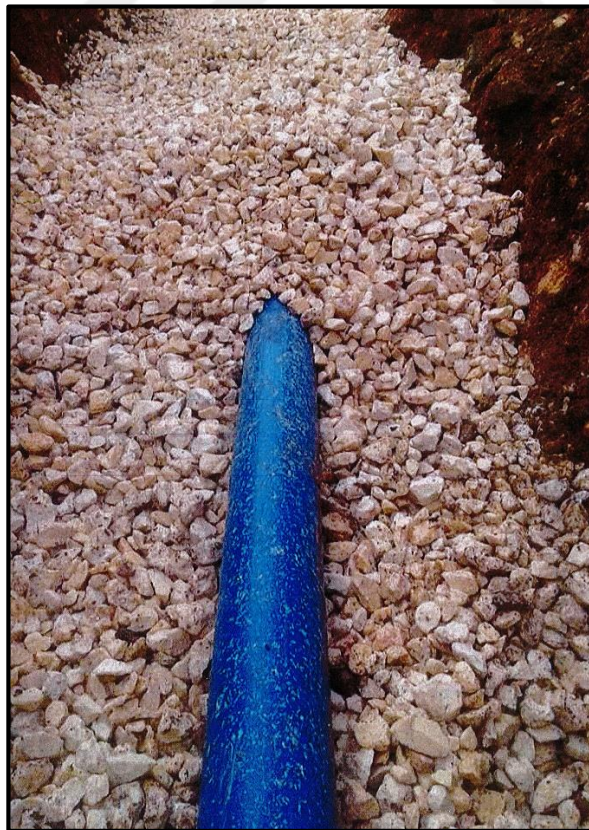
Pipe bedding and covering in PE 100 pipe laying
